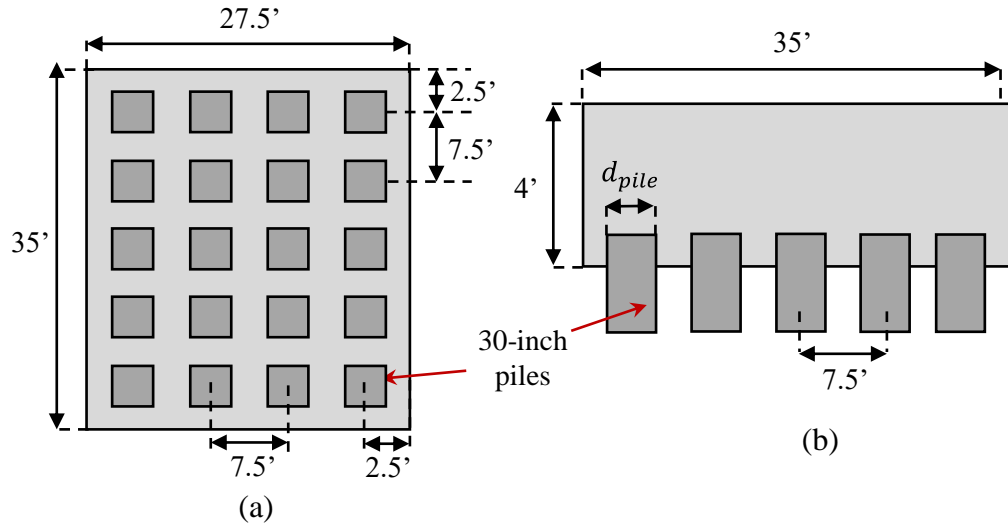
Pile cap details for 4x5 grid of 30-inch piles (a) plan view (b) cross section
